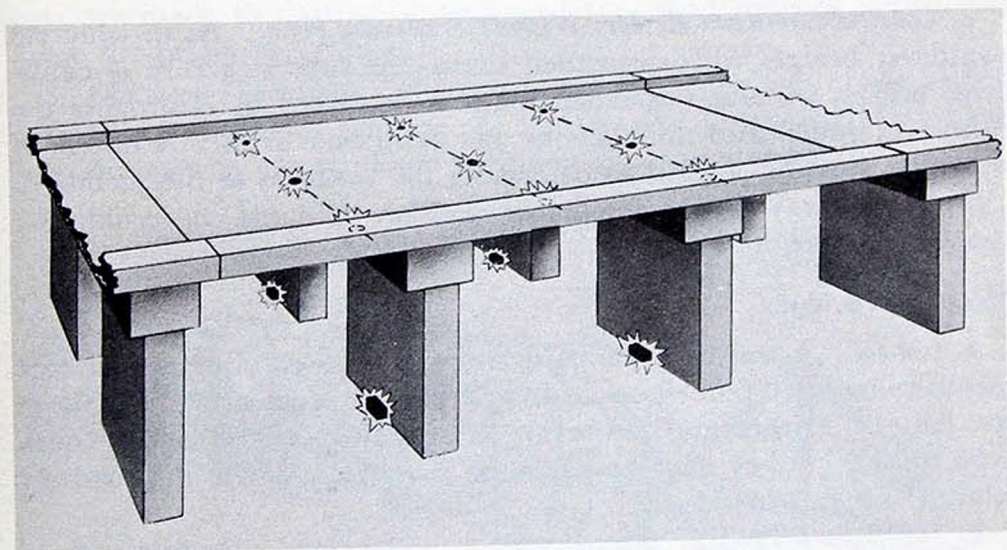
Placing charges on a concrete cantilever bridge without suspended span.
